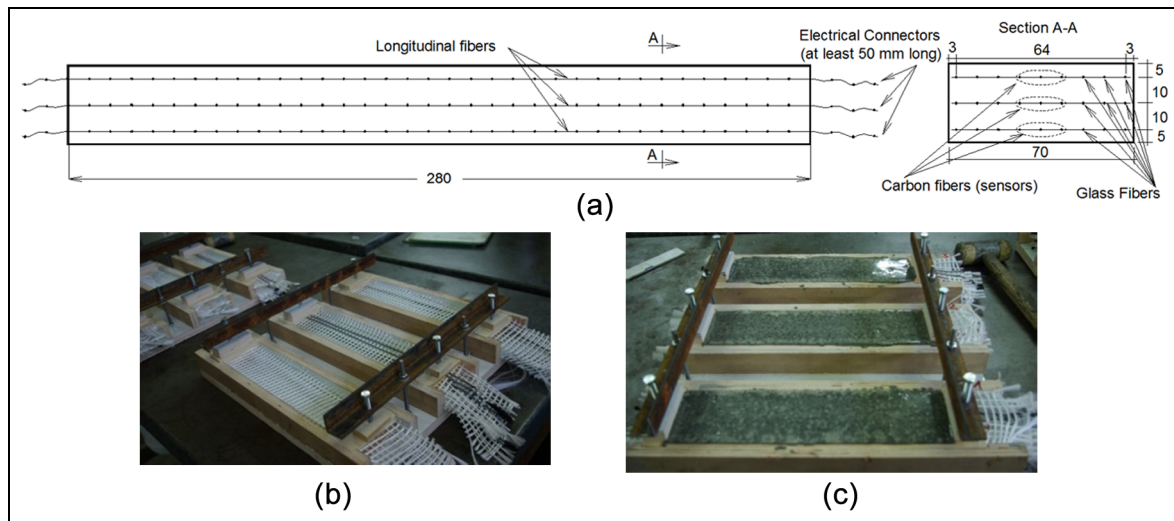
TRC specimens: (a) schematic drawing, cross section, and geometrical parameters (dimension in millimeters); (b) molds for three beams after placing the layers of sensory textile and before casting; and (c) molds after casting.
